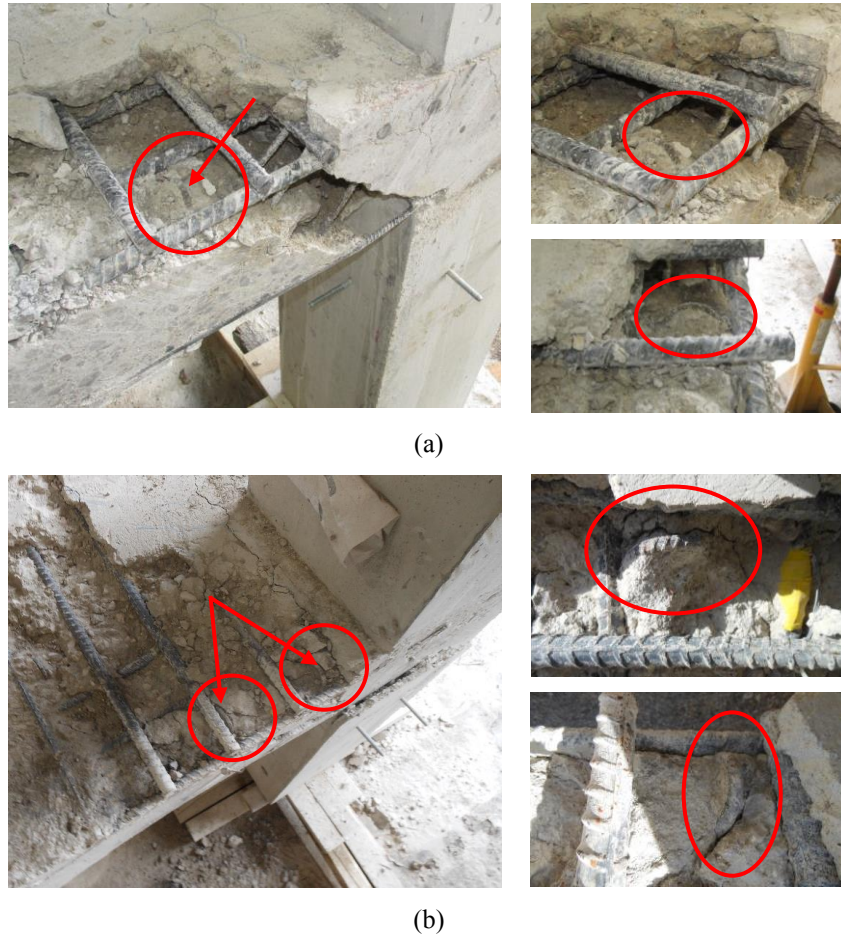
Anchorage Pull-Out Failure; (a) Slab 2, (b) Slab 3
